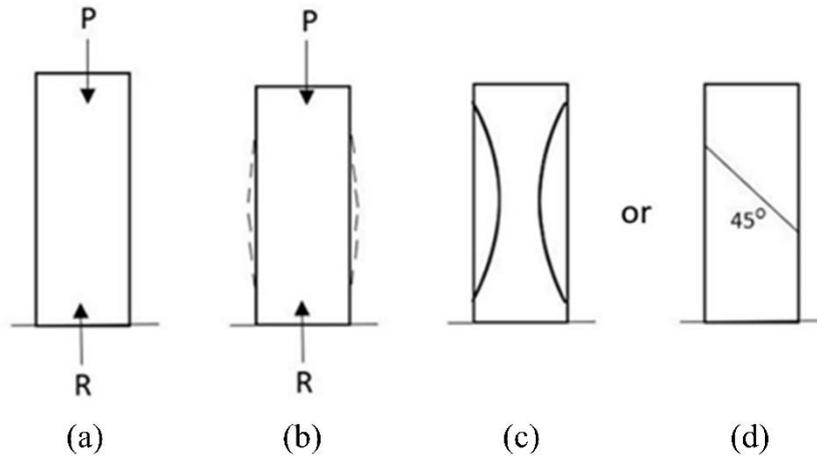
The concrete column behaviour under axial loading, a) beginning of the test, b) starting the lateral expansion, c) failure mode of the normal strength concrete and d) failure mode of the high strength concrete
